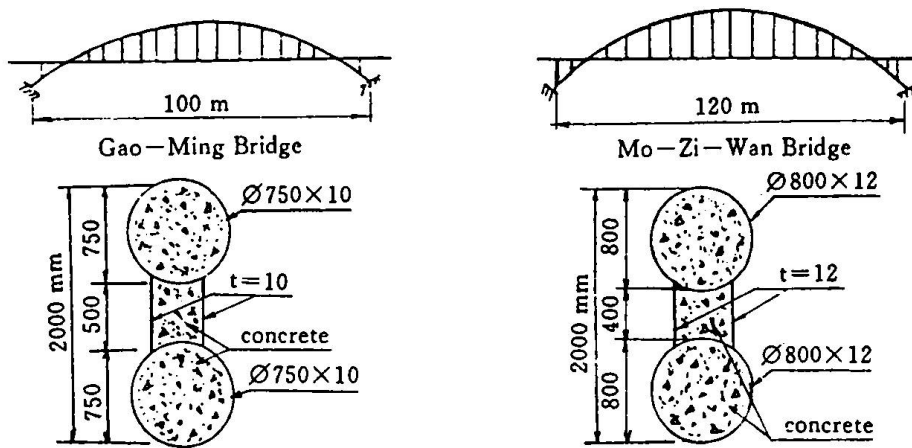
Gao-Ming Bridge and Mo-Zi-Wan Bridge
